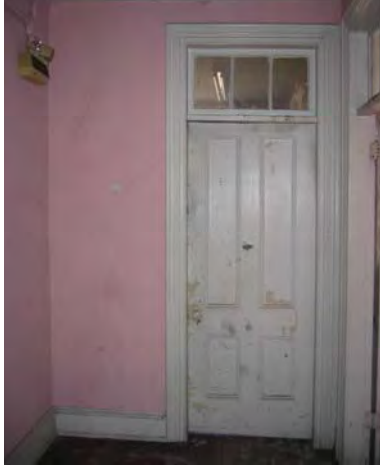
Plaster damage at south wall. (Photo: BBB, 2007)
